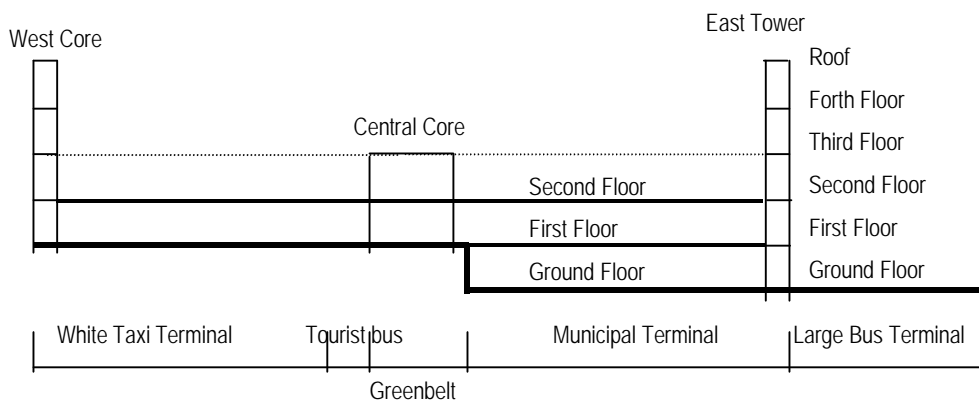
shows a general plan and Figure 3.2.2 shows a section through the Raghadan Bus Terminal.
